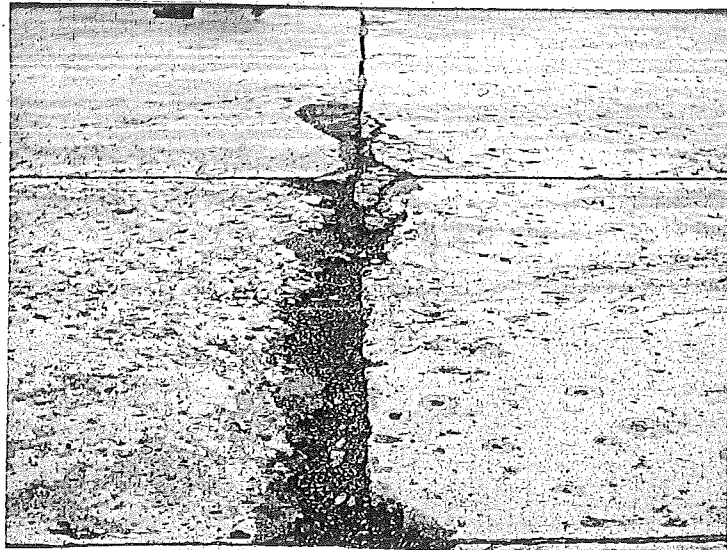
Project 39-12, C4, Sta. 555+30, 1-25-44. Quality of concrete questionable. Note disintegration at joints. Surface pitted from inferior aggregates and considerable longitudinal and transverse cracking was evident. Pavement 14 years old.
